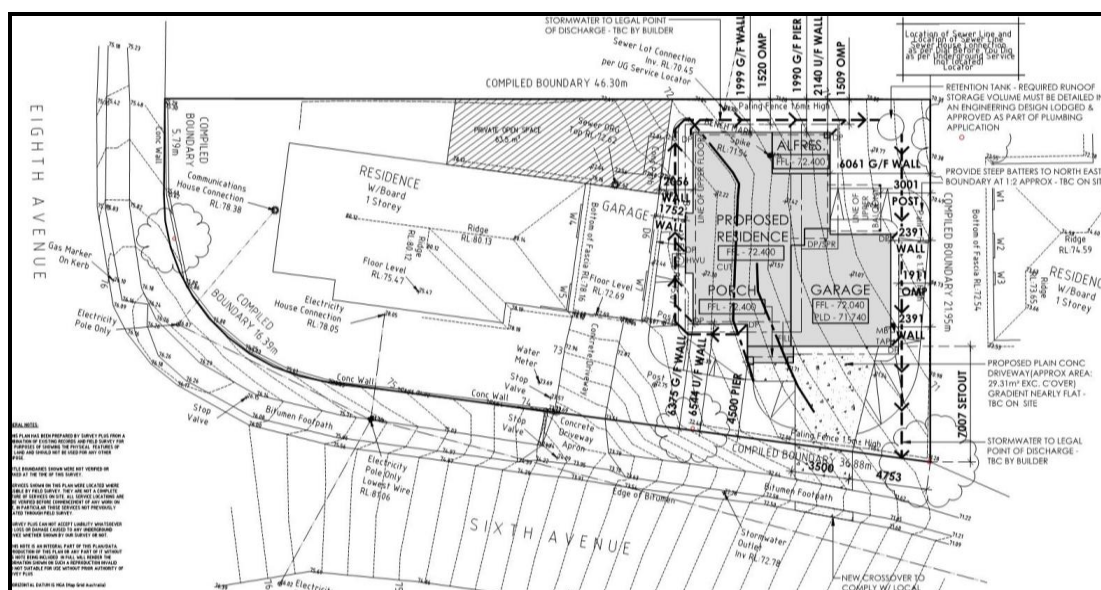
Site plan of 26 Sixth Avenue, West Moonah.
